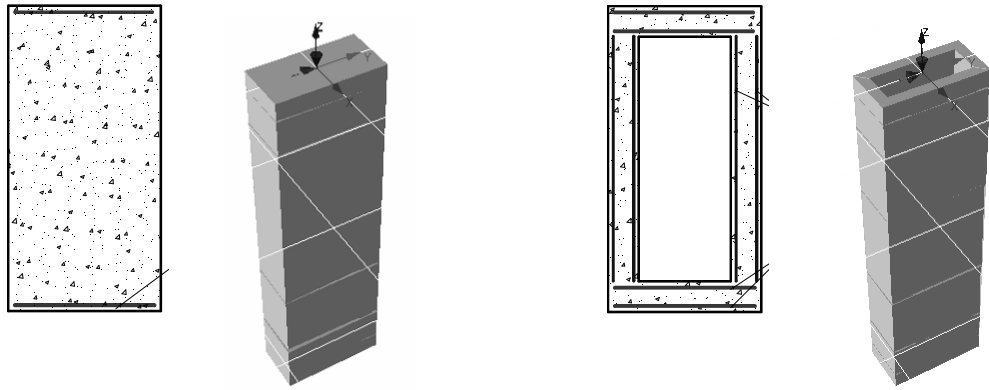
Solid (*left*) and hollow (*right*) reinforced concrete cross section piers.
